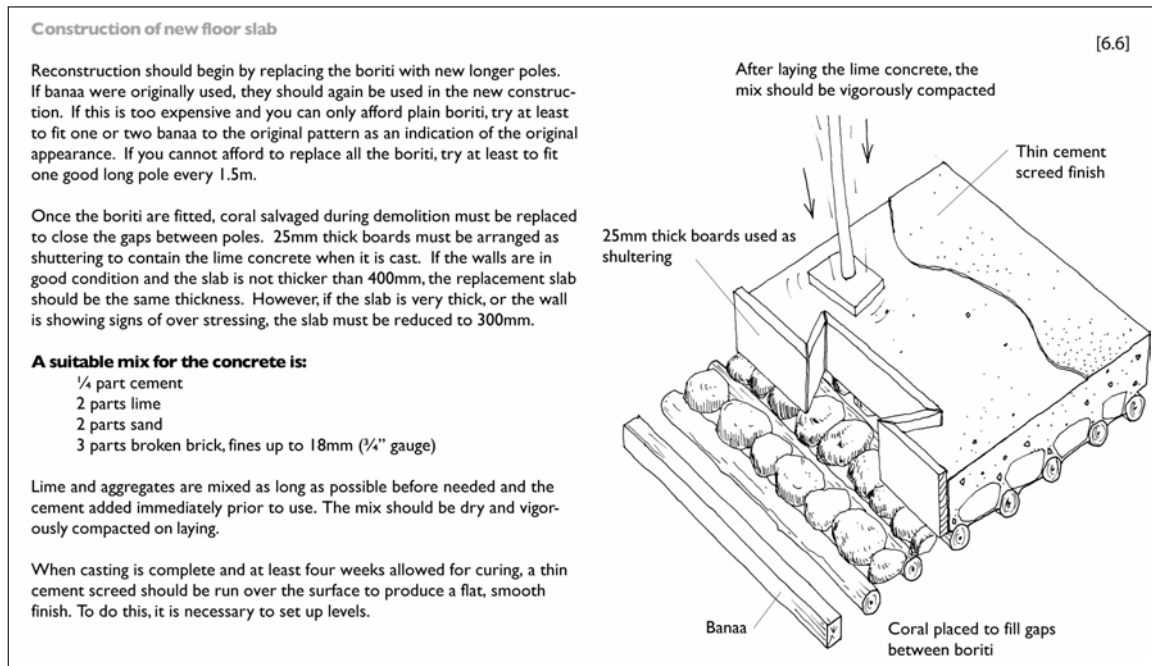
Conservation and Design Guidelines for Zanzibar Stone Town. Procedure for replacing floor slabs. Tab 6.6. [Battle and Steel, 2001.]
